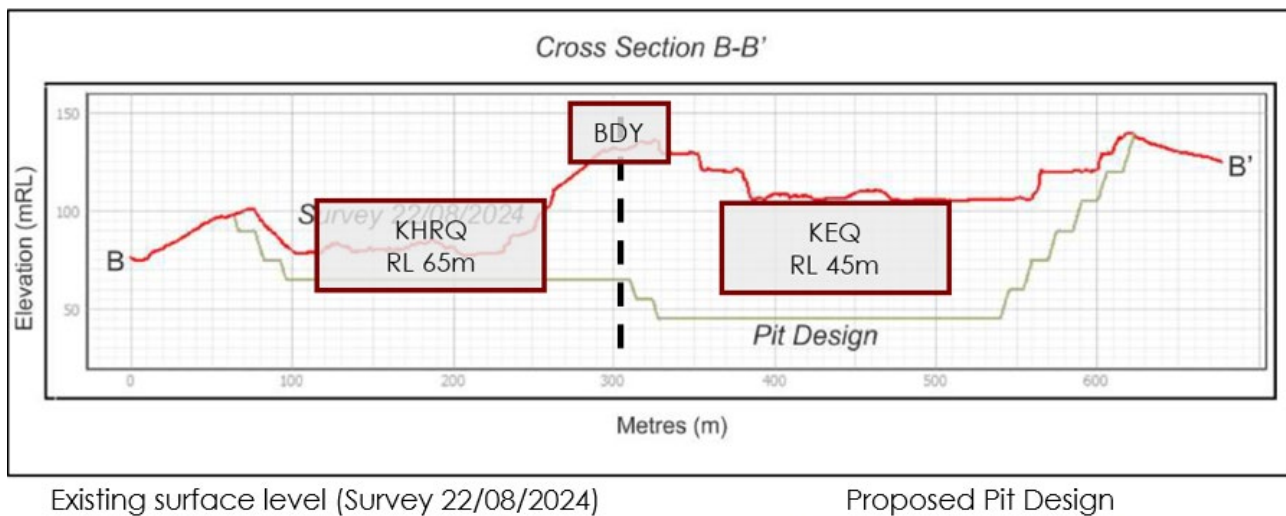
Typical Section of Remnant Highwall Removal on KHRQ/KEQ Boundary
